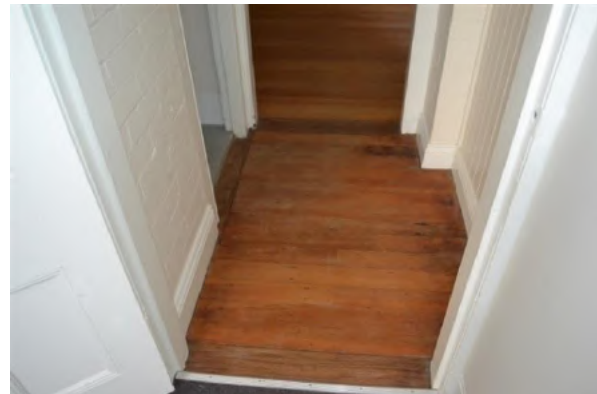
The raised timber floor of the former rear porch (space G.4) with original timber thresholds and nosings to steps—50 / 46-56 Gloucester Street. (Source: GML Heritage, June 2016)
